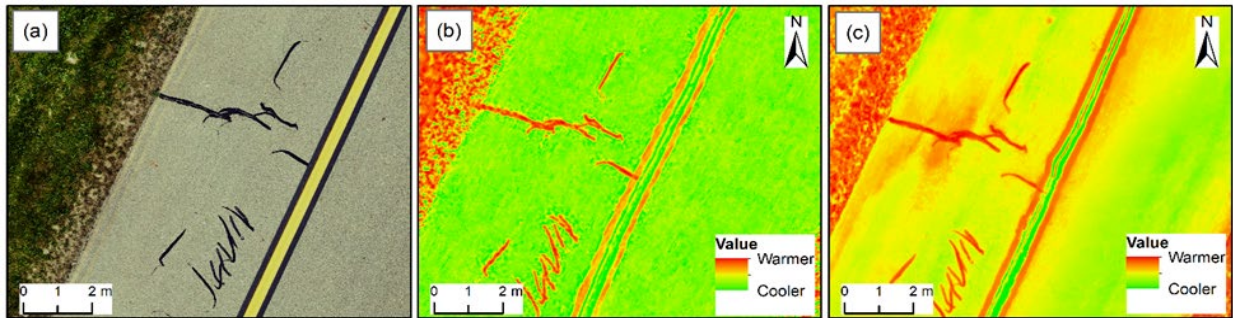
Sealed L&T Cracks on AC Pavement in Taxiway A Sample Unit 23 at TTF:
